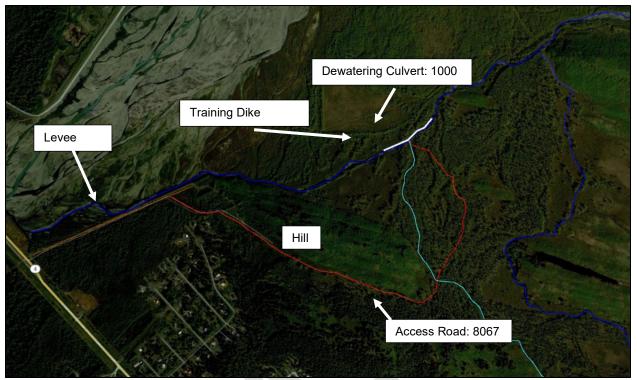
Clearing and grubbing to project site for Alternative A and Alternative C.
